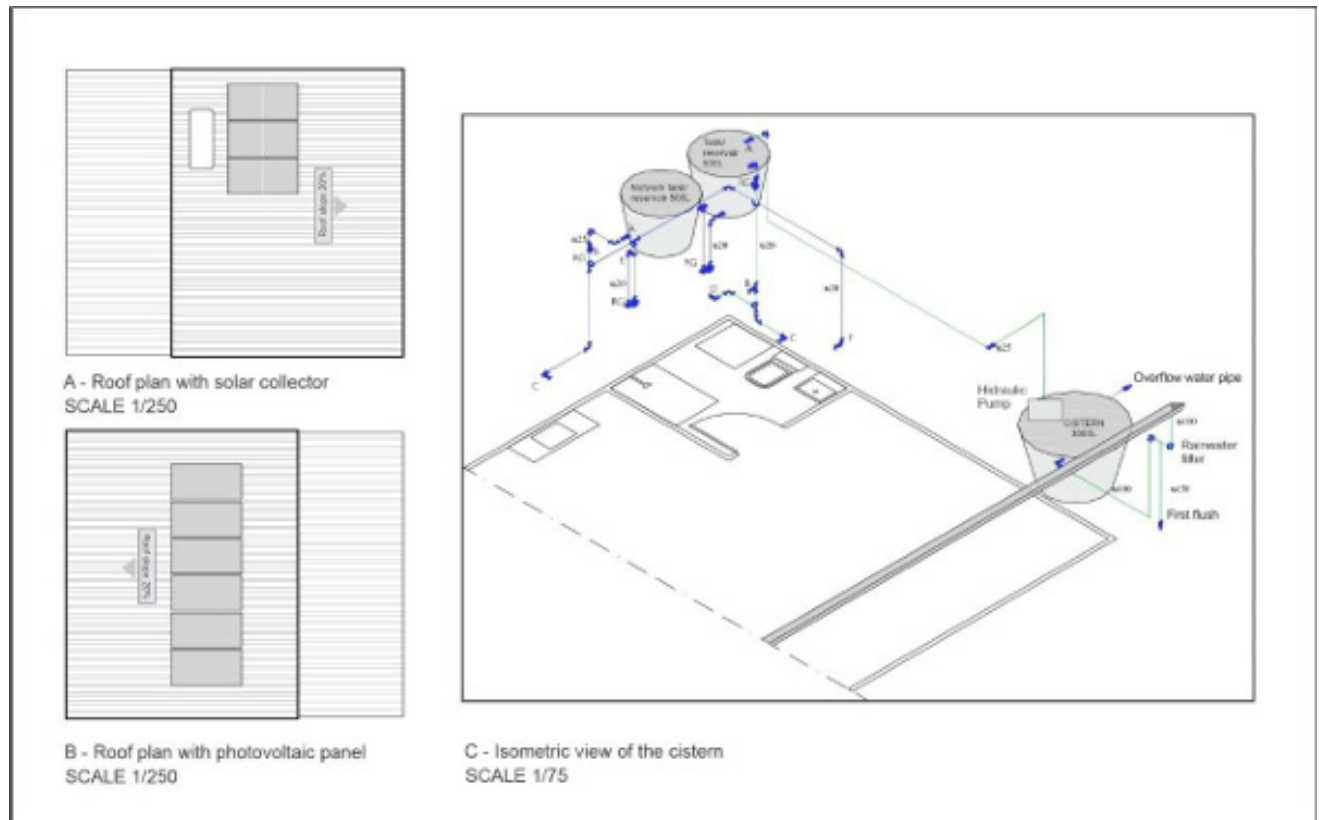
Sustainable residential model with proposed technologies. (A) Roof plan with solar collector; (B) roof plan with photovoltaic panel; and (C) isometric view of the cistern.
